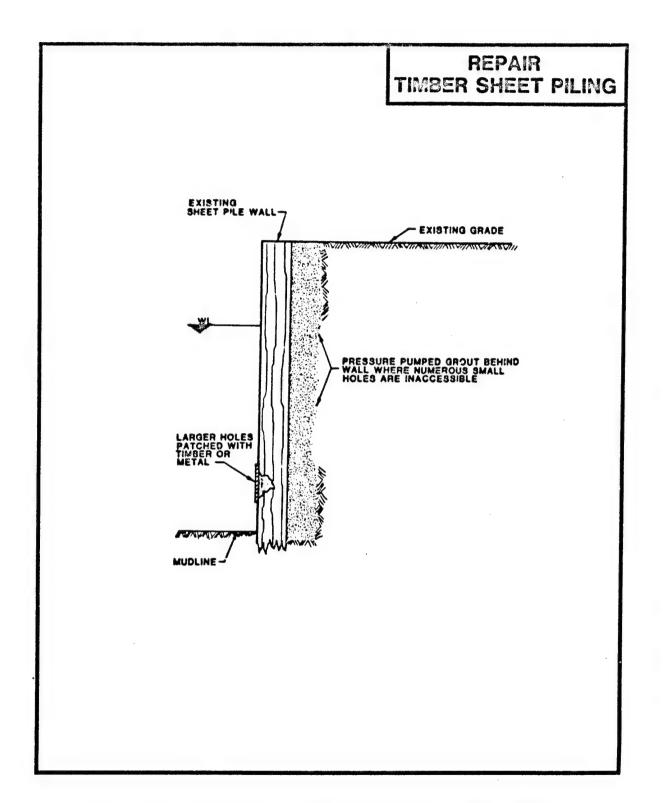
Patching Large Holes in Timber Sheet Piling Wall.
